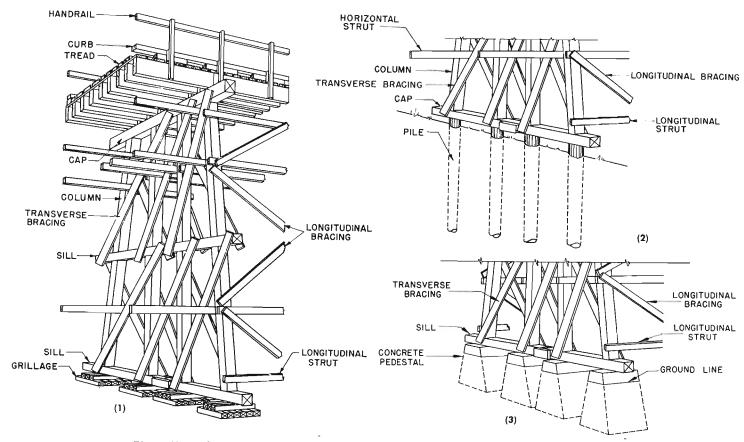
Highway bridge, class 50, single-lane, timber stringer spans, framed timber tower:
